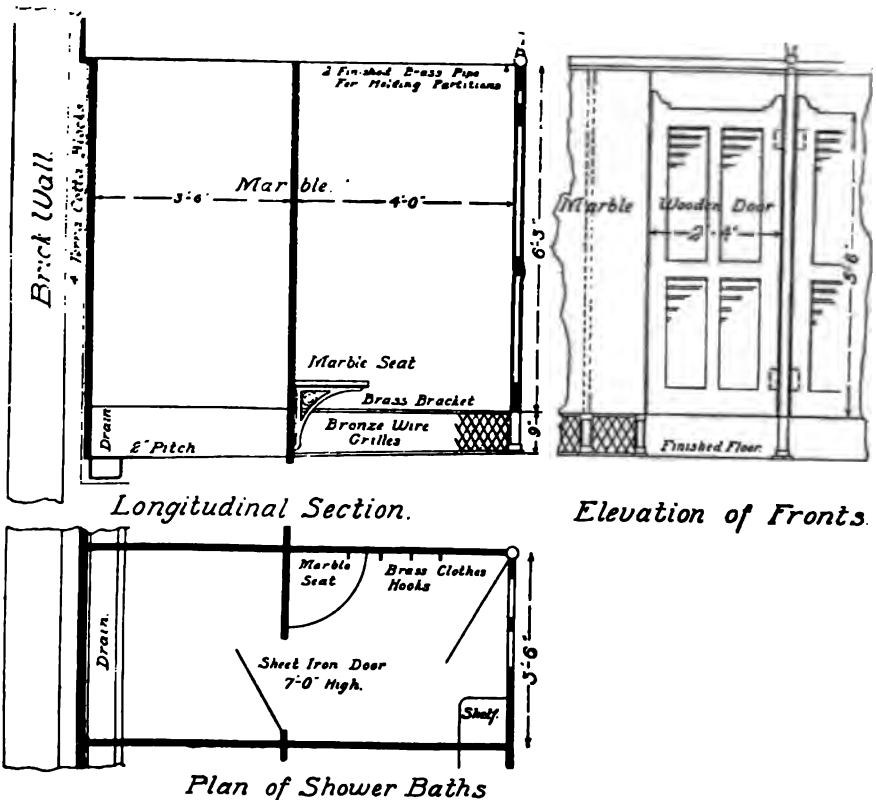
PLAN OF TYPICAL SHOWER BATH.
